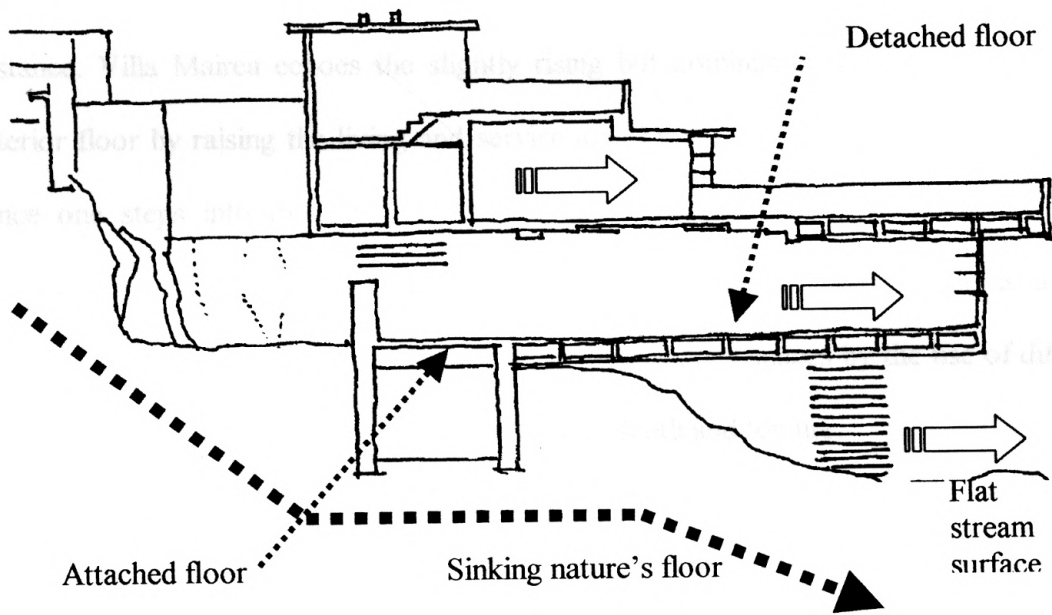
The relation of Fallingwater's floor with natural floor.
